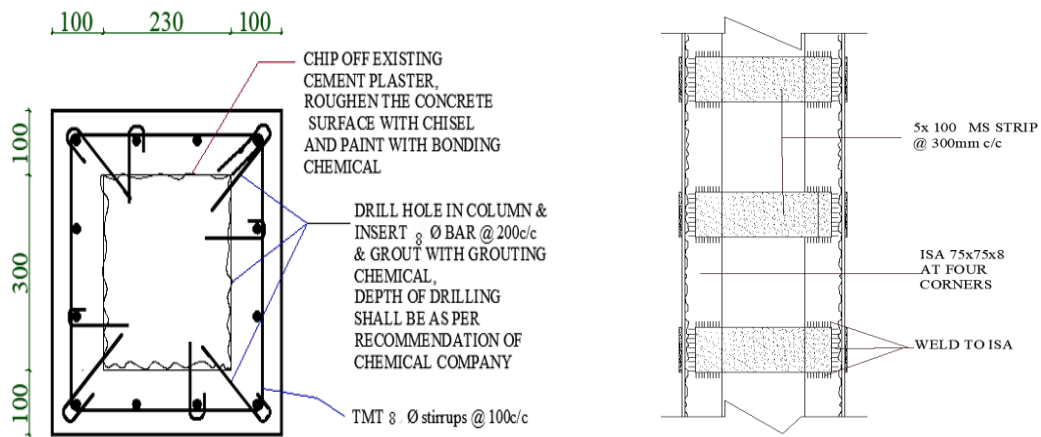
Detail of Steel Jacketing Plan (a), Typical Section of Steel Jacketing (b)
